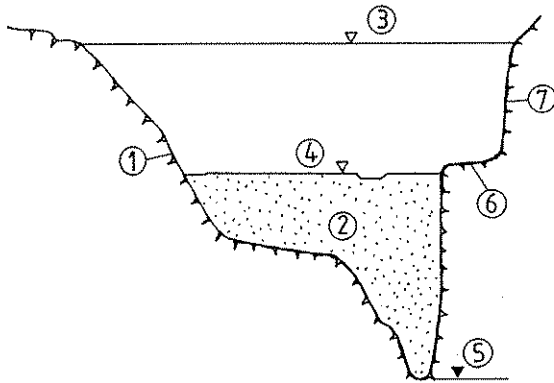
Sylvenstein dam, valley section (adapted from Lorenz 1966).
